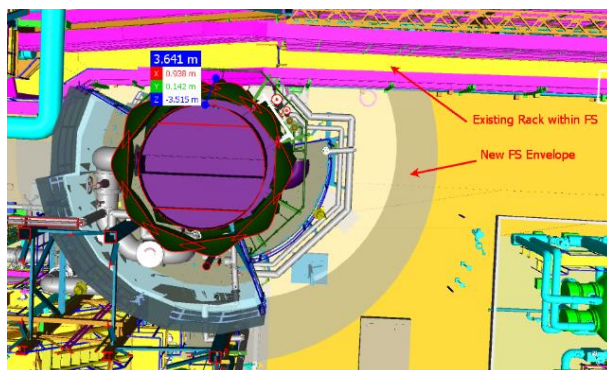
Extent of Fireproofing for Existing Ladder Frame/Structure (Grid-2).
